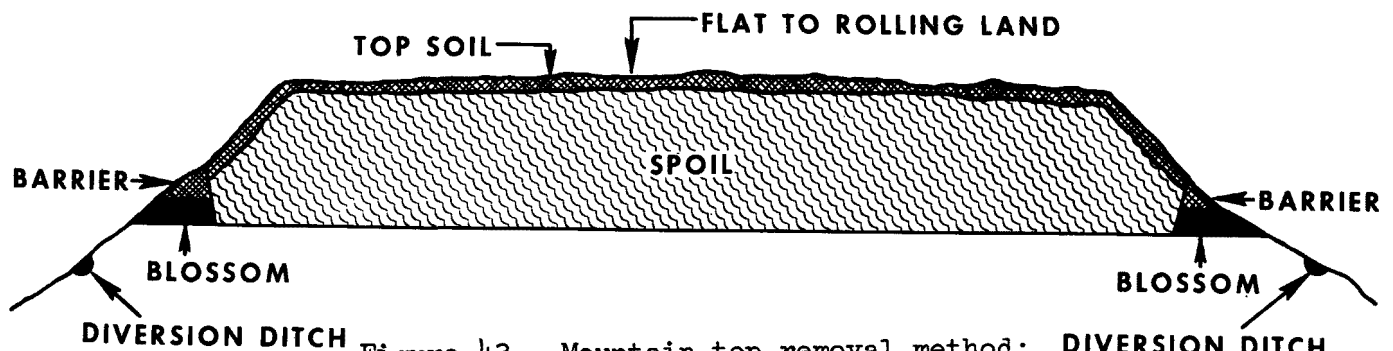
Mountain-top removal method: Mountain top after final grading and topsoiling
